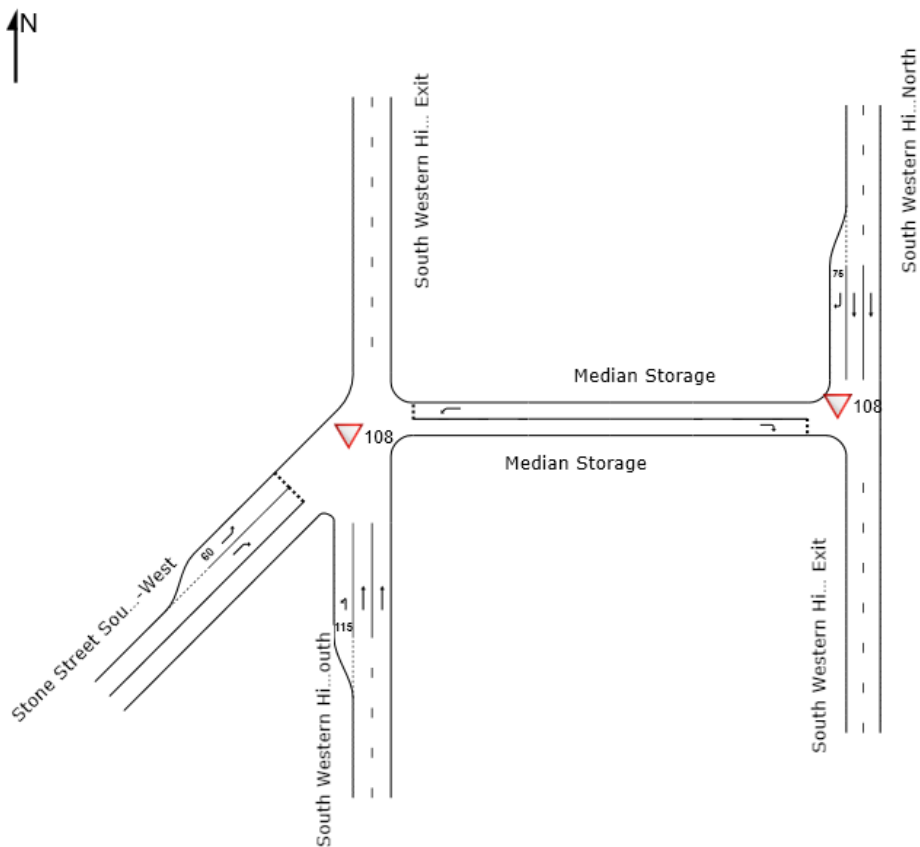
SWH/ Stone St – two staged intersection layout – with SWH duplication
